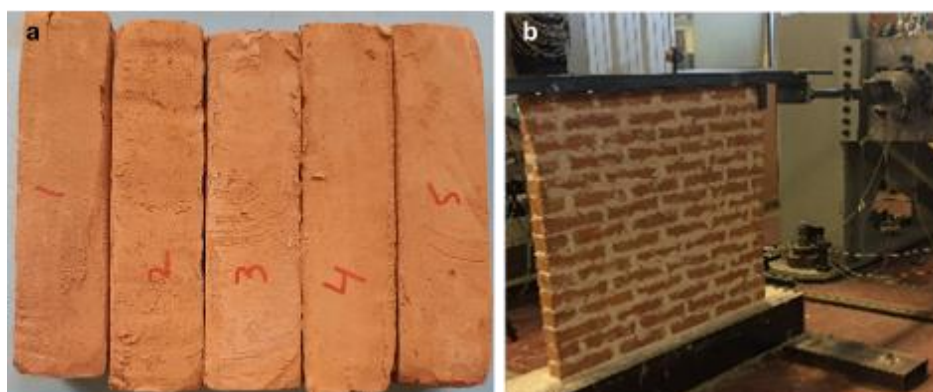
23. Fired bricks samples (a) and horizontal loading of fired bricks wall
